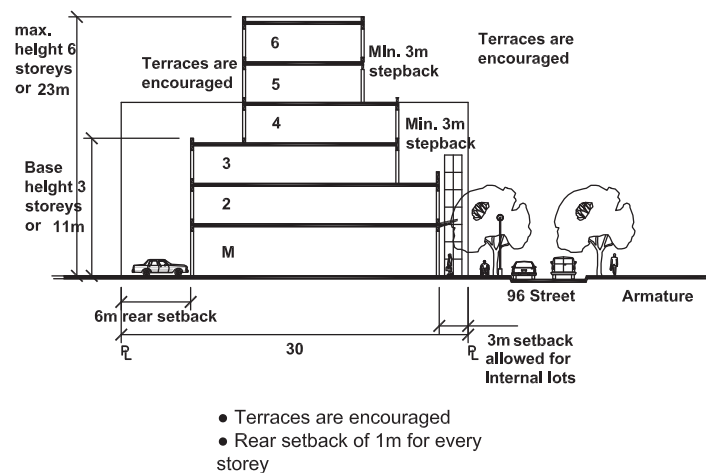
Setback guidelines in the Armature - 96 Street West
